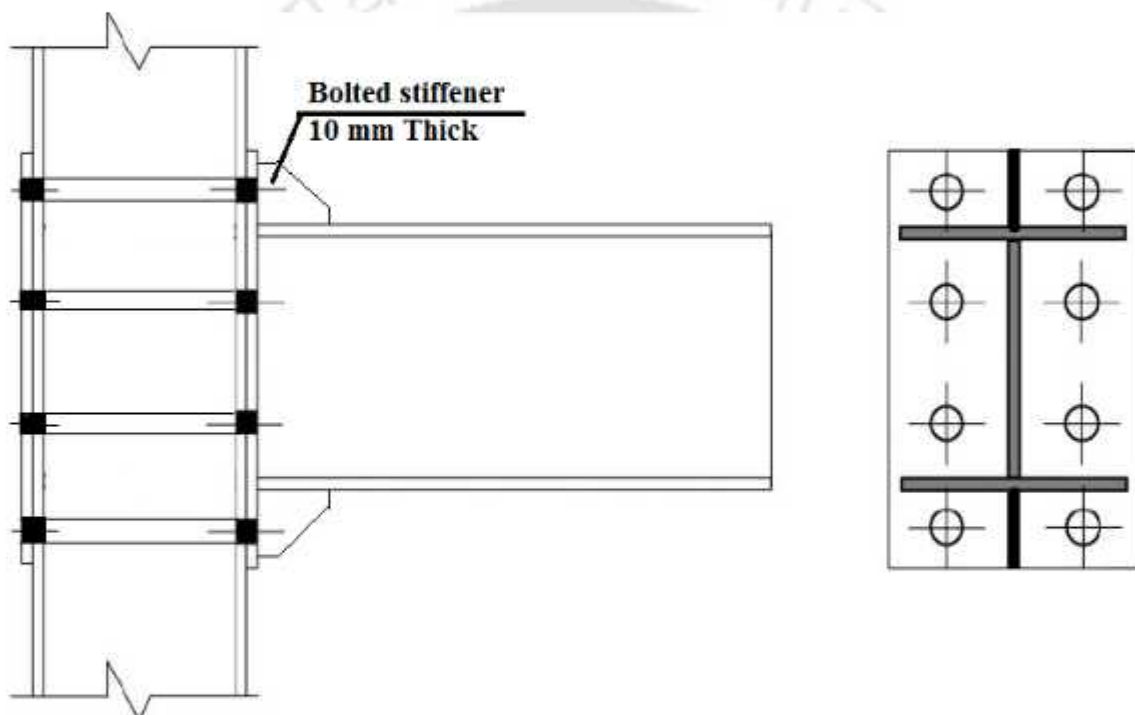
Details of 4 bolt stiffened end-plate connection geometry (4ES).
